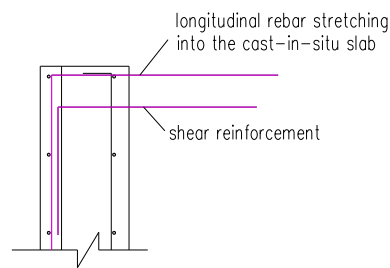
Front view of the dry connection detailingFigure 2b. Section 1-1Figure 2c. Section 2-2Figure 2d. Detailing of wet connection
